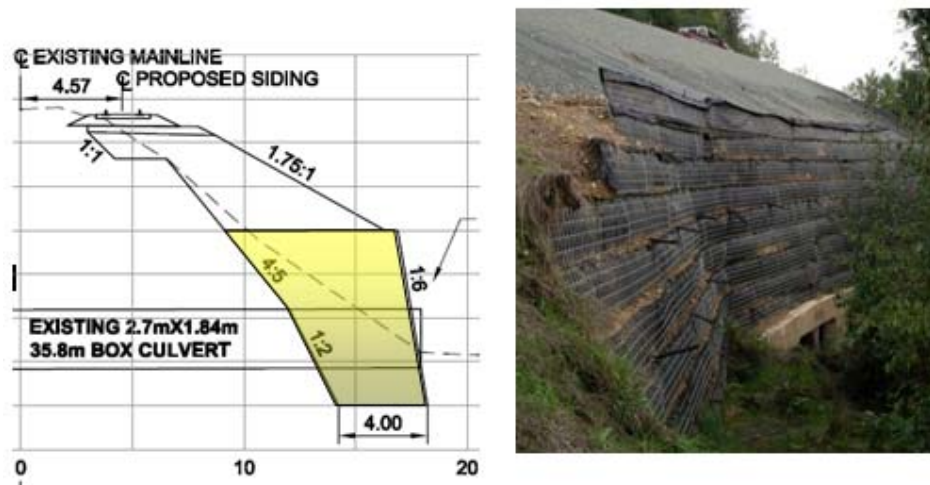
Matheson Siding: Bittner Creek. View Looking Track-south at Completed Wall Illustrating how the Wall Blends into the Standard Fill Slope Section.
